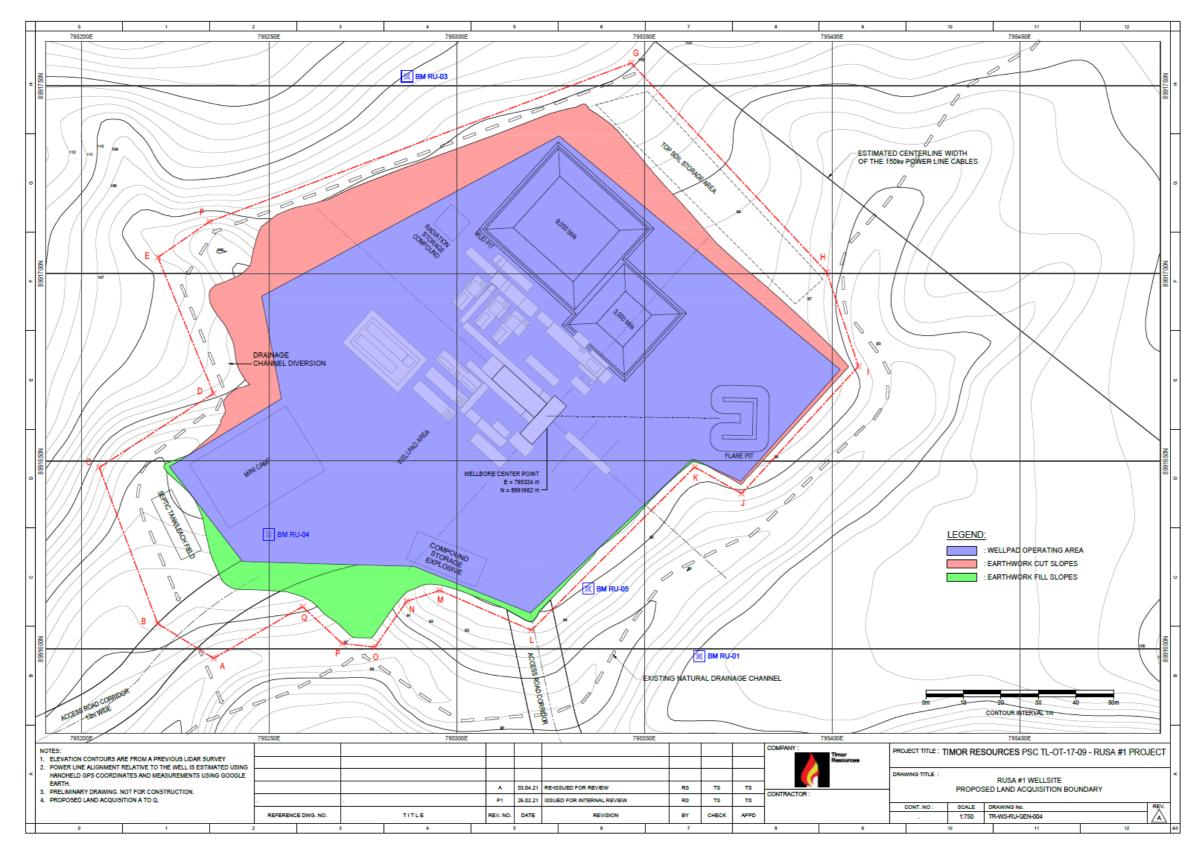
Rusa-1well layout. Subject to further surveying, civil engineering and design.
